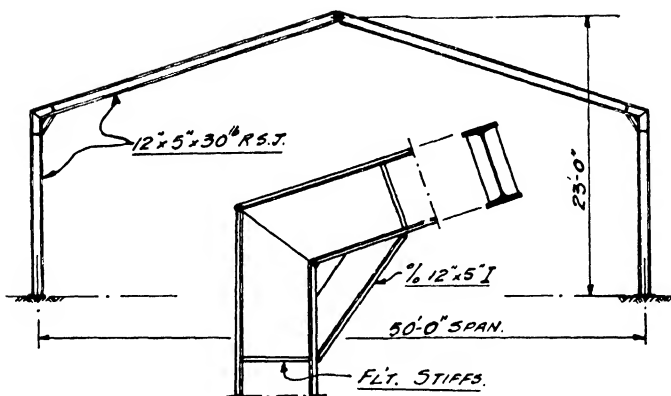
THREE-HINGE PORTAL FRAME WITH R.S.J. RAFTERS AND COLUMNS
